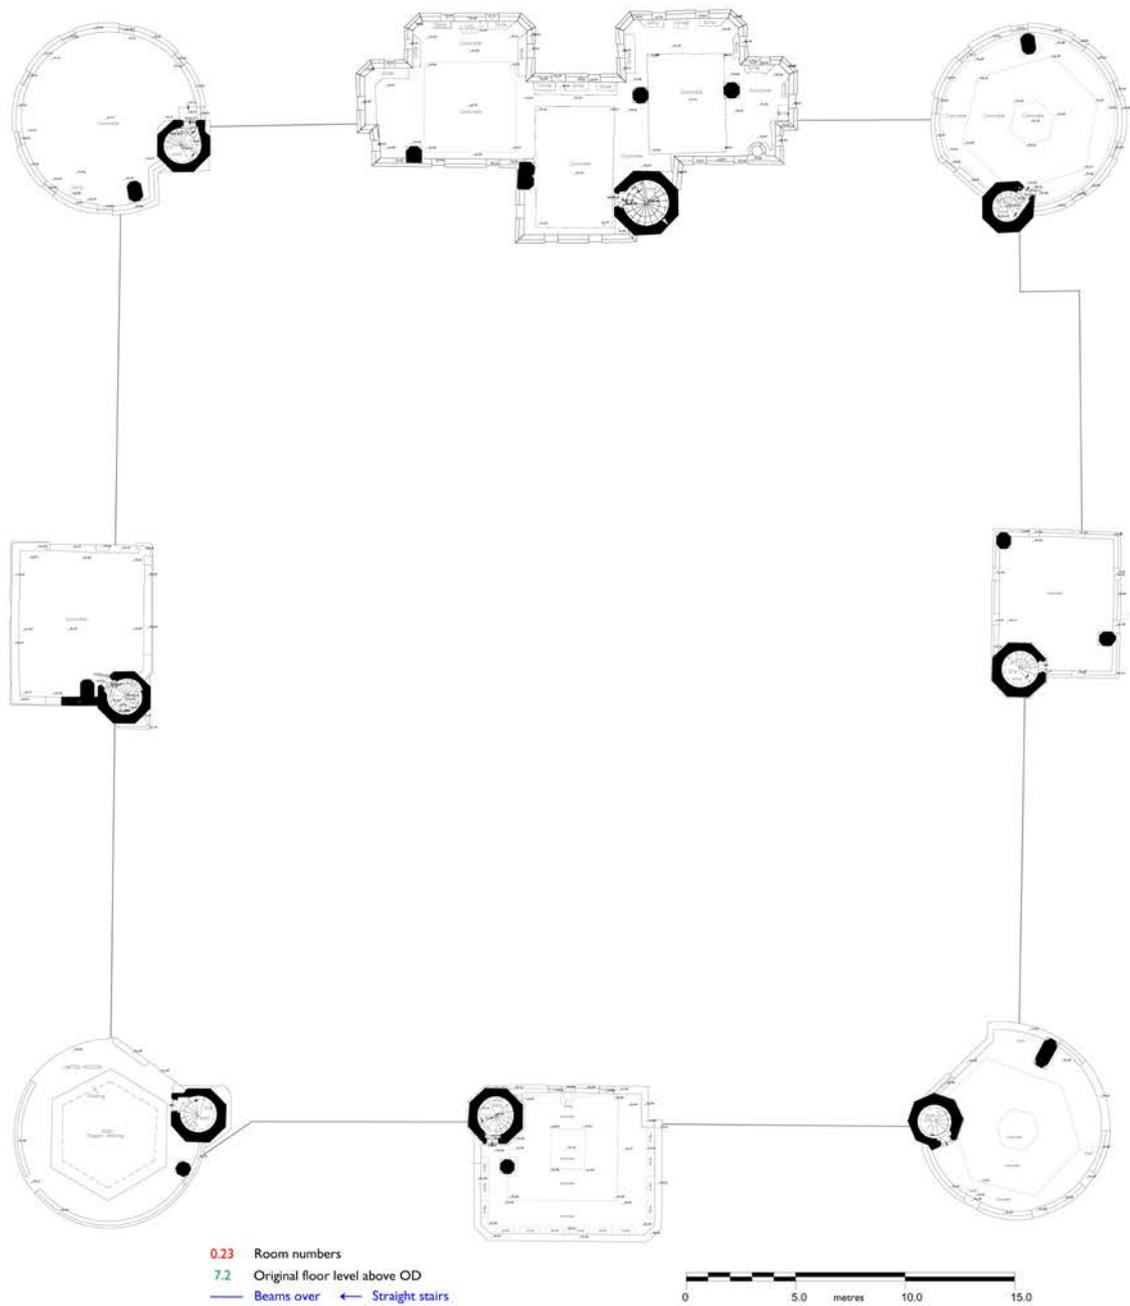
Bodiam Castle Third Floor Plan (based on a survey by James Brennan Associates); reconstructed lines and walls in grey tone
